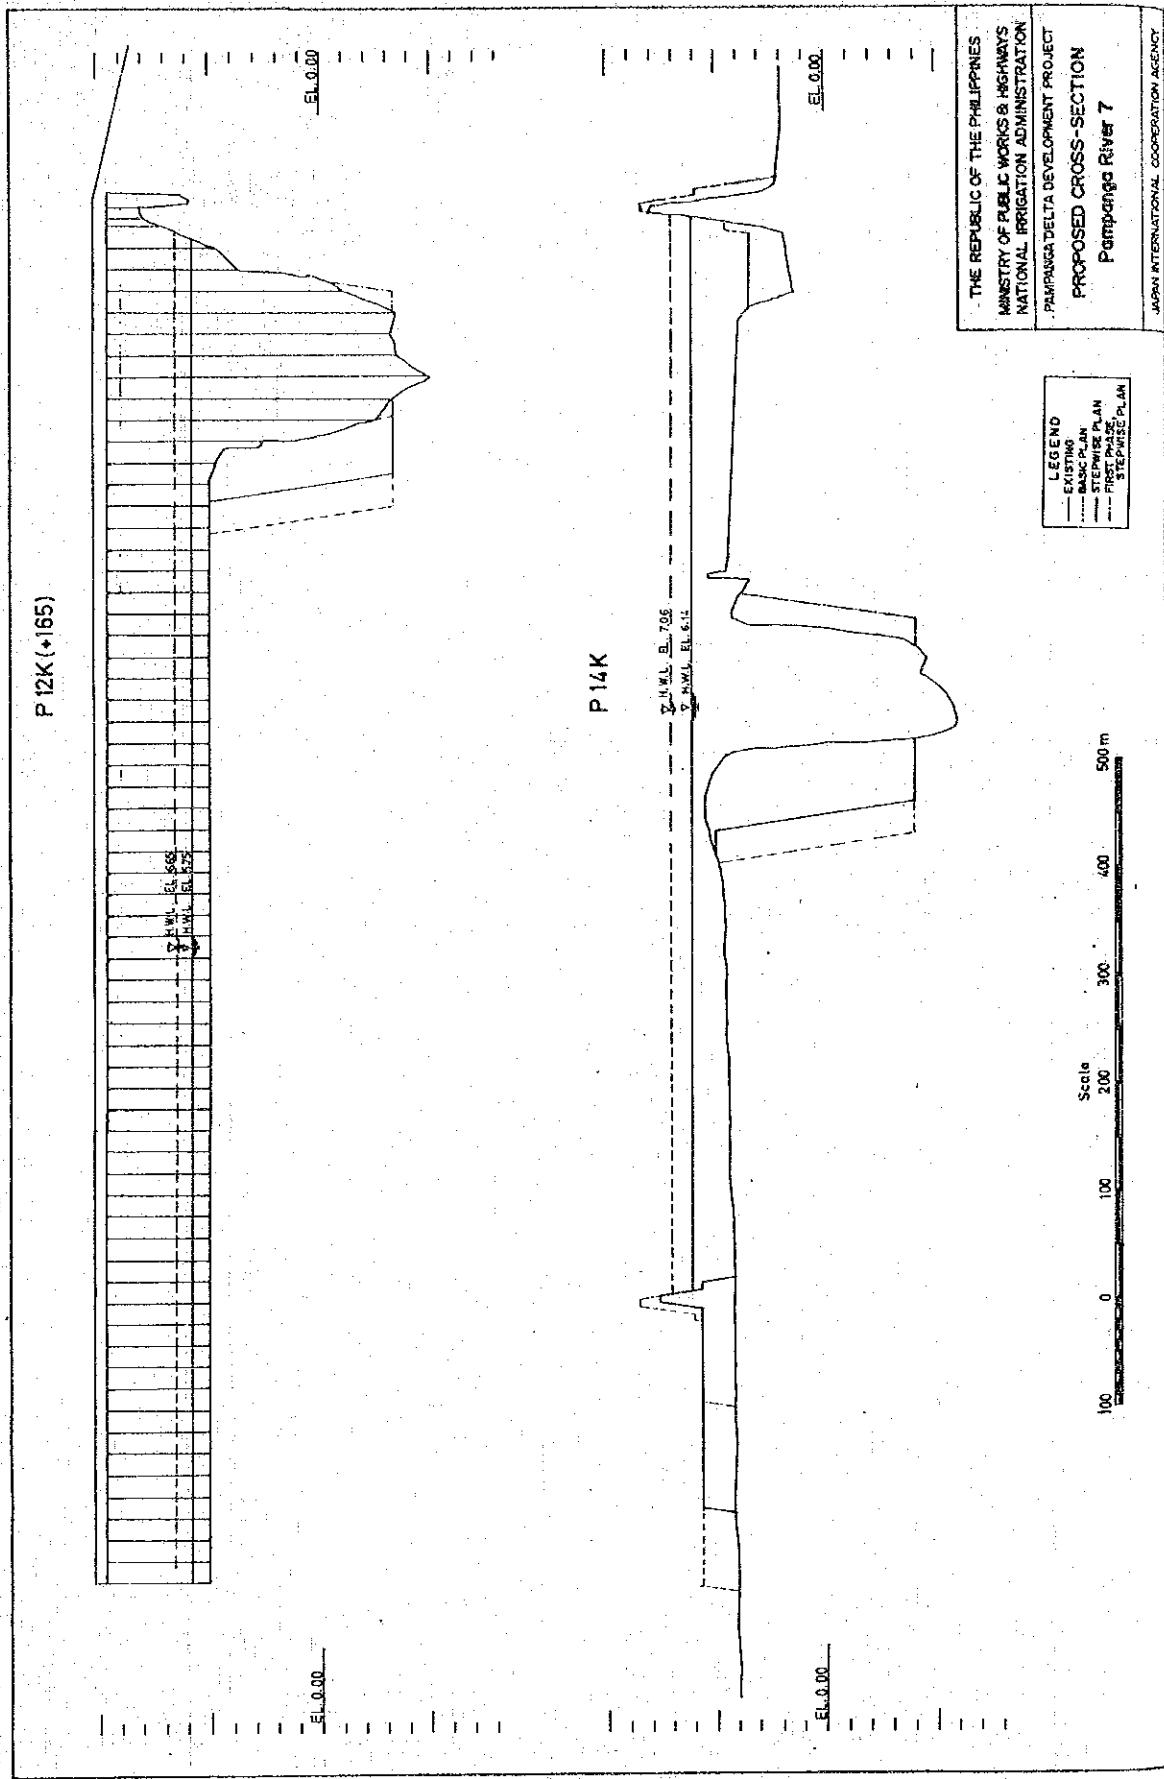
(8) PROPOSED CHANNEL CROSS-SECTION
